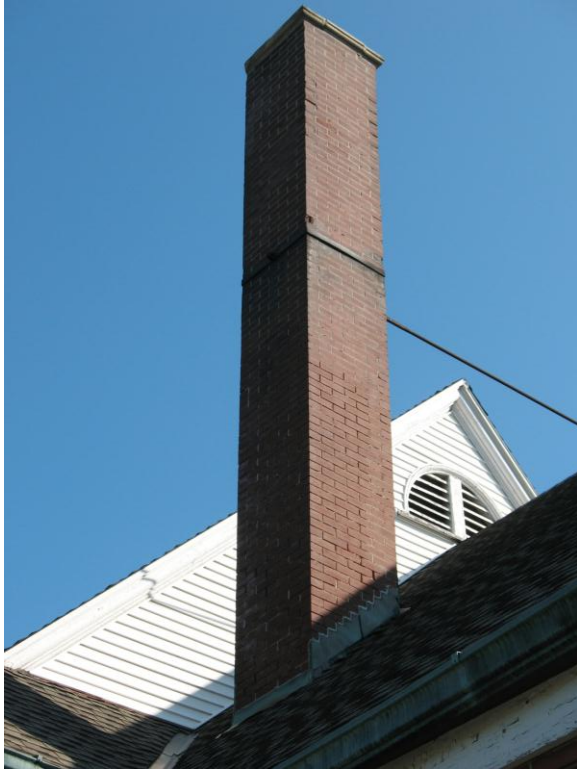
Overall view of chimney from the southeast showing steel band and anchor rod extending toward gable ridge.
